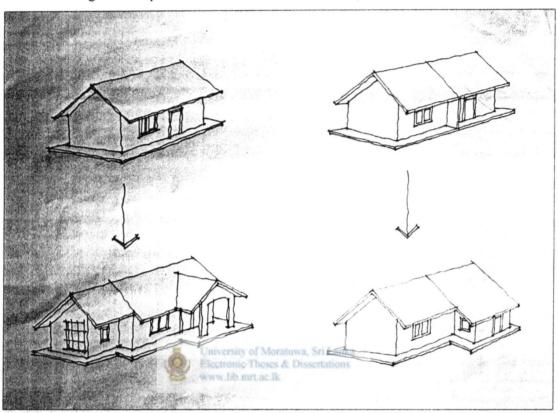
, 3.9: Typical modification of detached single house single story and attached twin house single story
